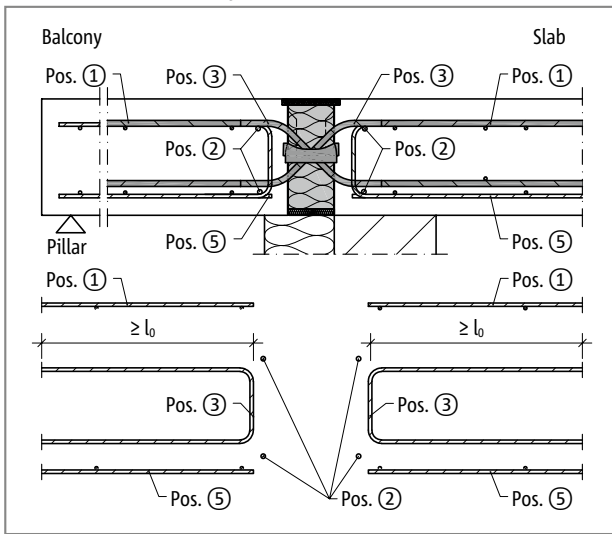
Schöck Isokorb® T type Q-E-VV: On-site reinforcement
